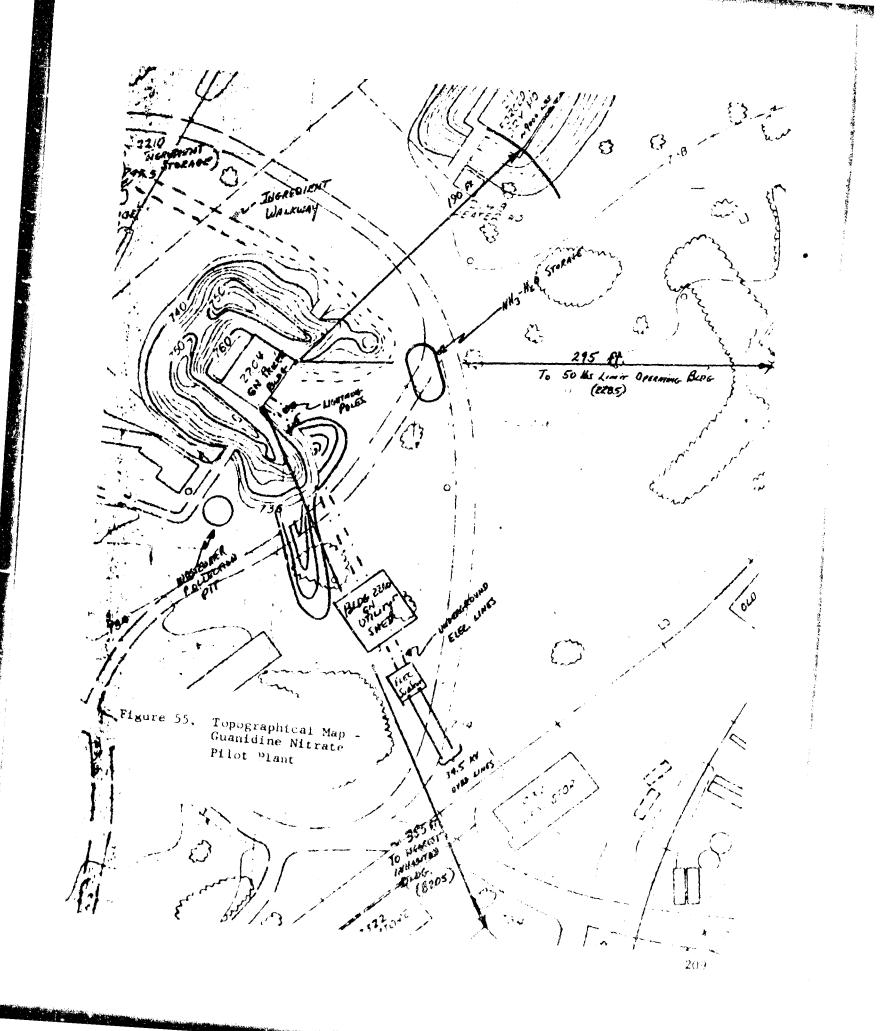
shows a topographic map pointing out the area layout of the guanidine nitrate pilot plant. The key items on this map are the relation of the pilot plant building to adjacent buildings, the location of the electric substation and utility building (housing the chiller, vacuum pumps and steam boilers), the placement of the ammonia-water storage tank and the siting of necessary waste disposal and safety provisions.
